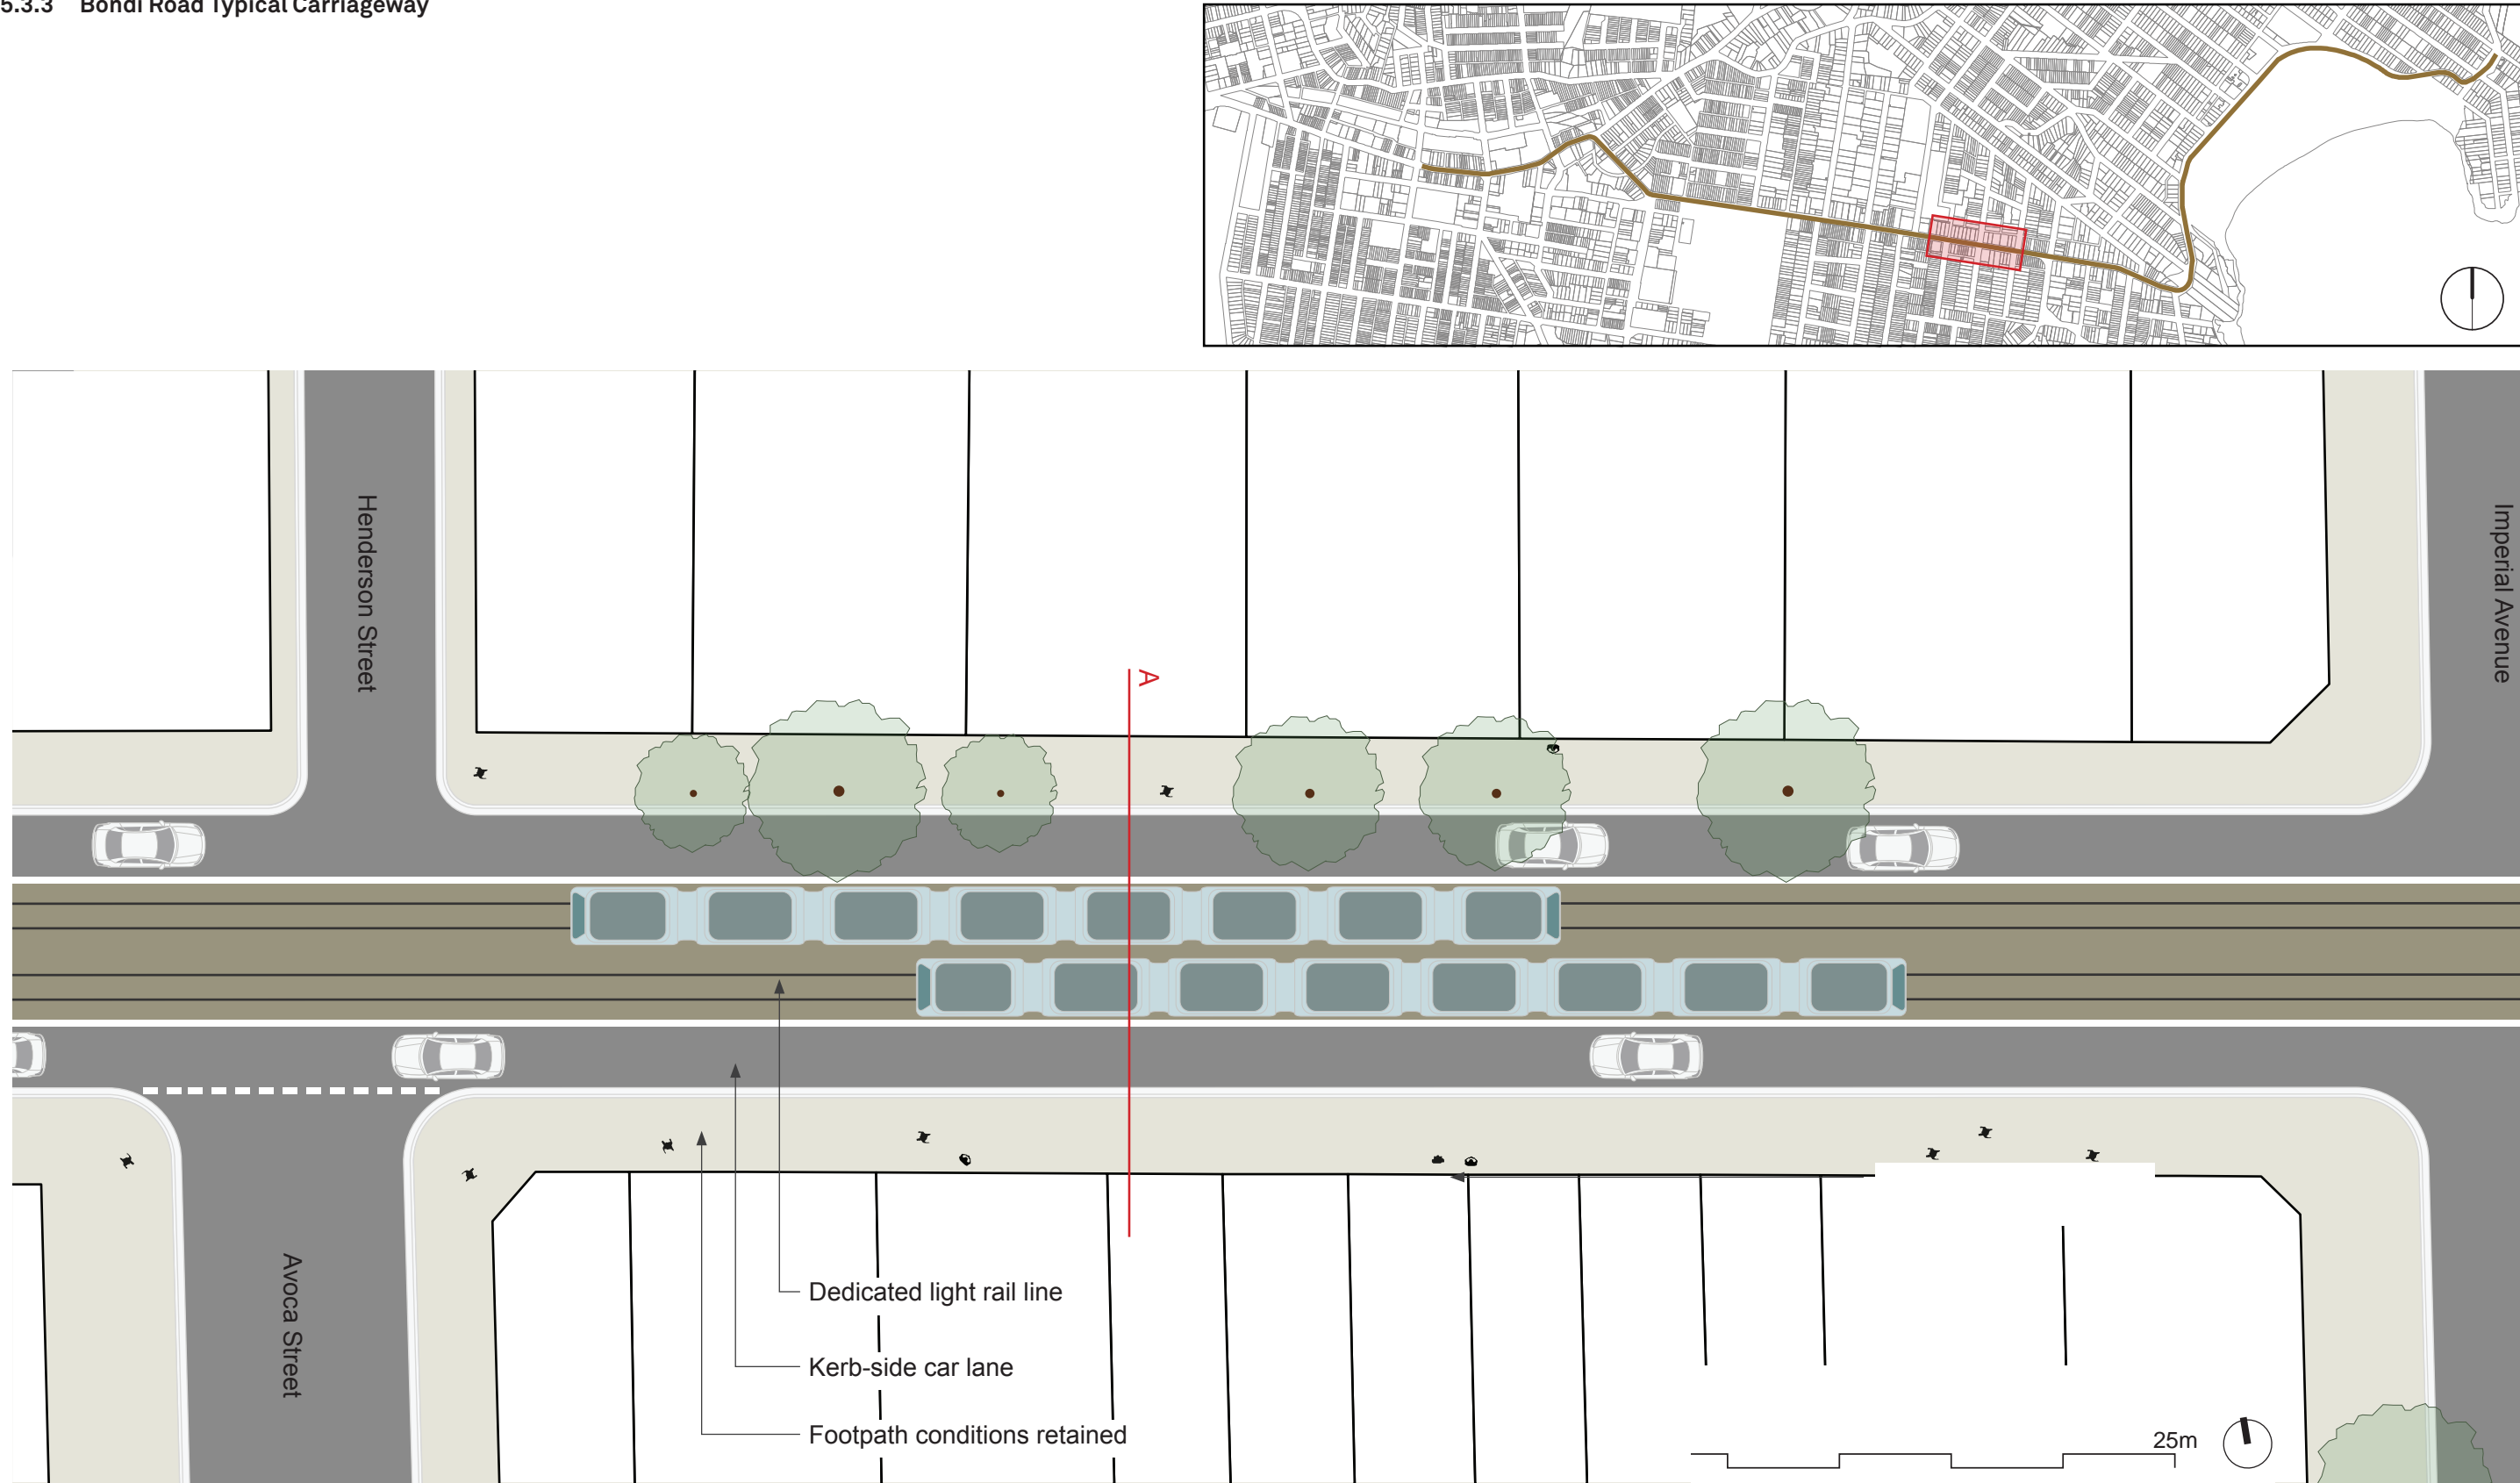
Bondi Road Typical Carriageway: Indicative Layout
